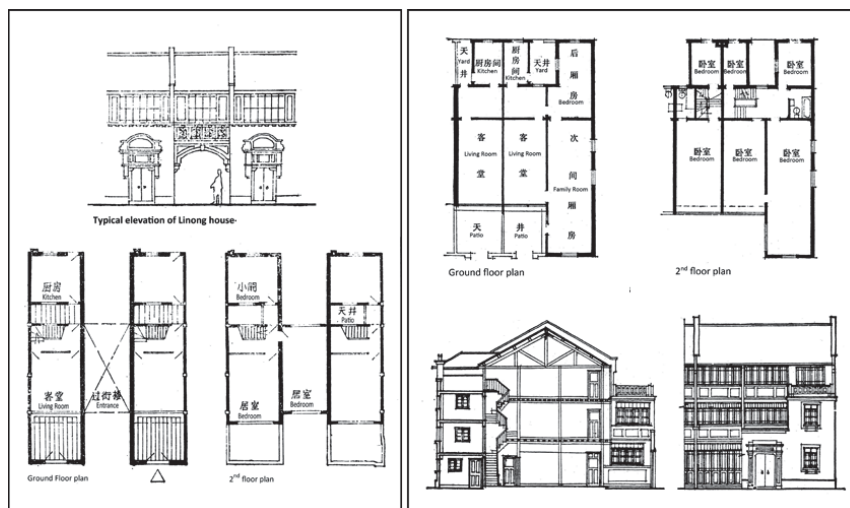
Typical floor plan, section and elevation of Linong houses
